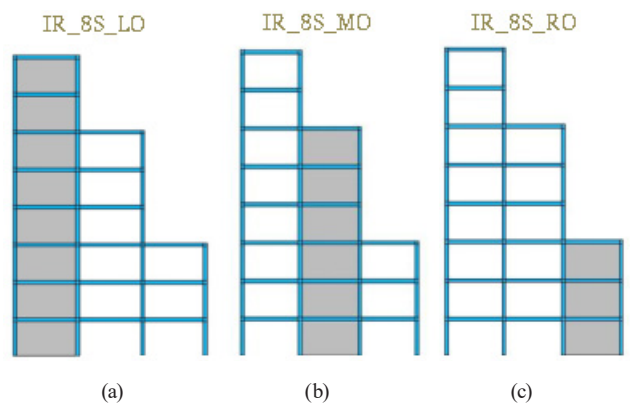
The irregular 8-story reinforced concrete structure with a shear wall in the (a) left, (b) middle and (c) right openings
